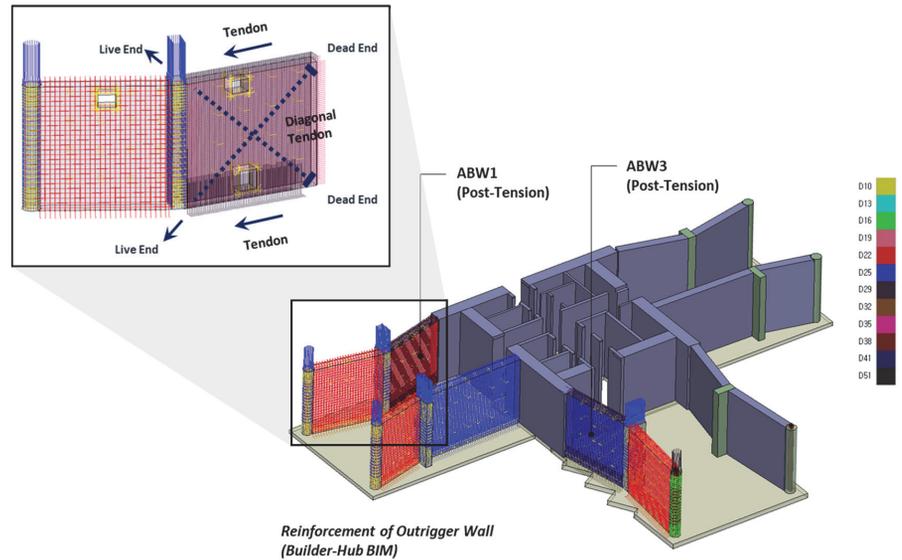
Post-tensioned outrigger walls of 28th floor.
